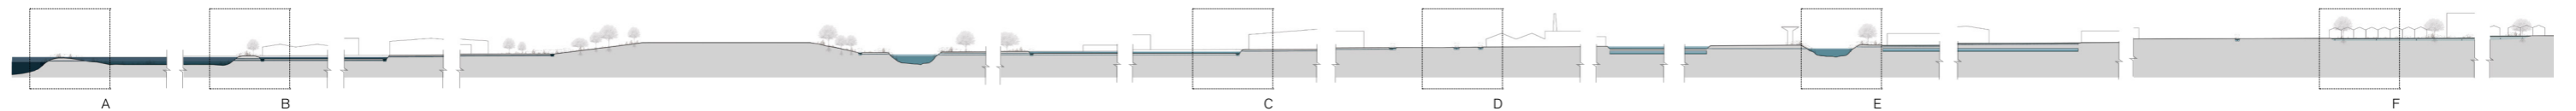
Section upstream to downstream, Technical details. Illustration : Author
